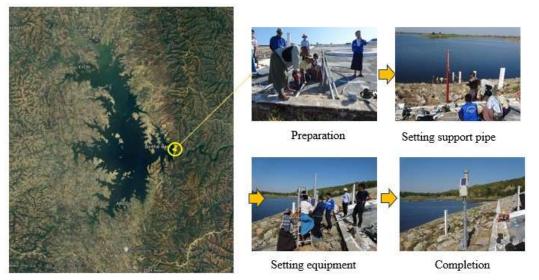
Location of TM and TM equipment installed at Shinthe Dam
